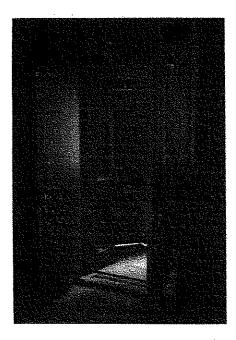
Temporary protection during construction can involve covering historic features, such as floors and walls, as well as using temporary doors to control the passage of workers and the inevitable dust and dirt. Prominently located fire extinguishers are mandatory. Photo: Lonnie Hovey, AIA, The Octagon.
